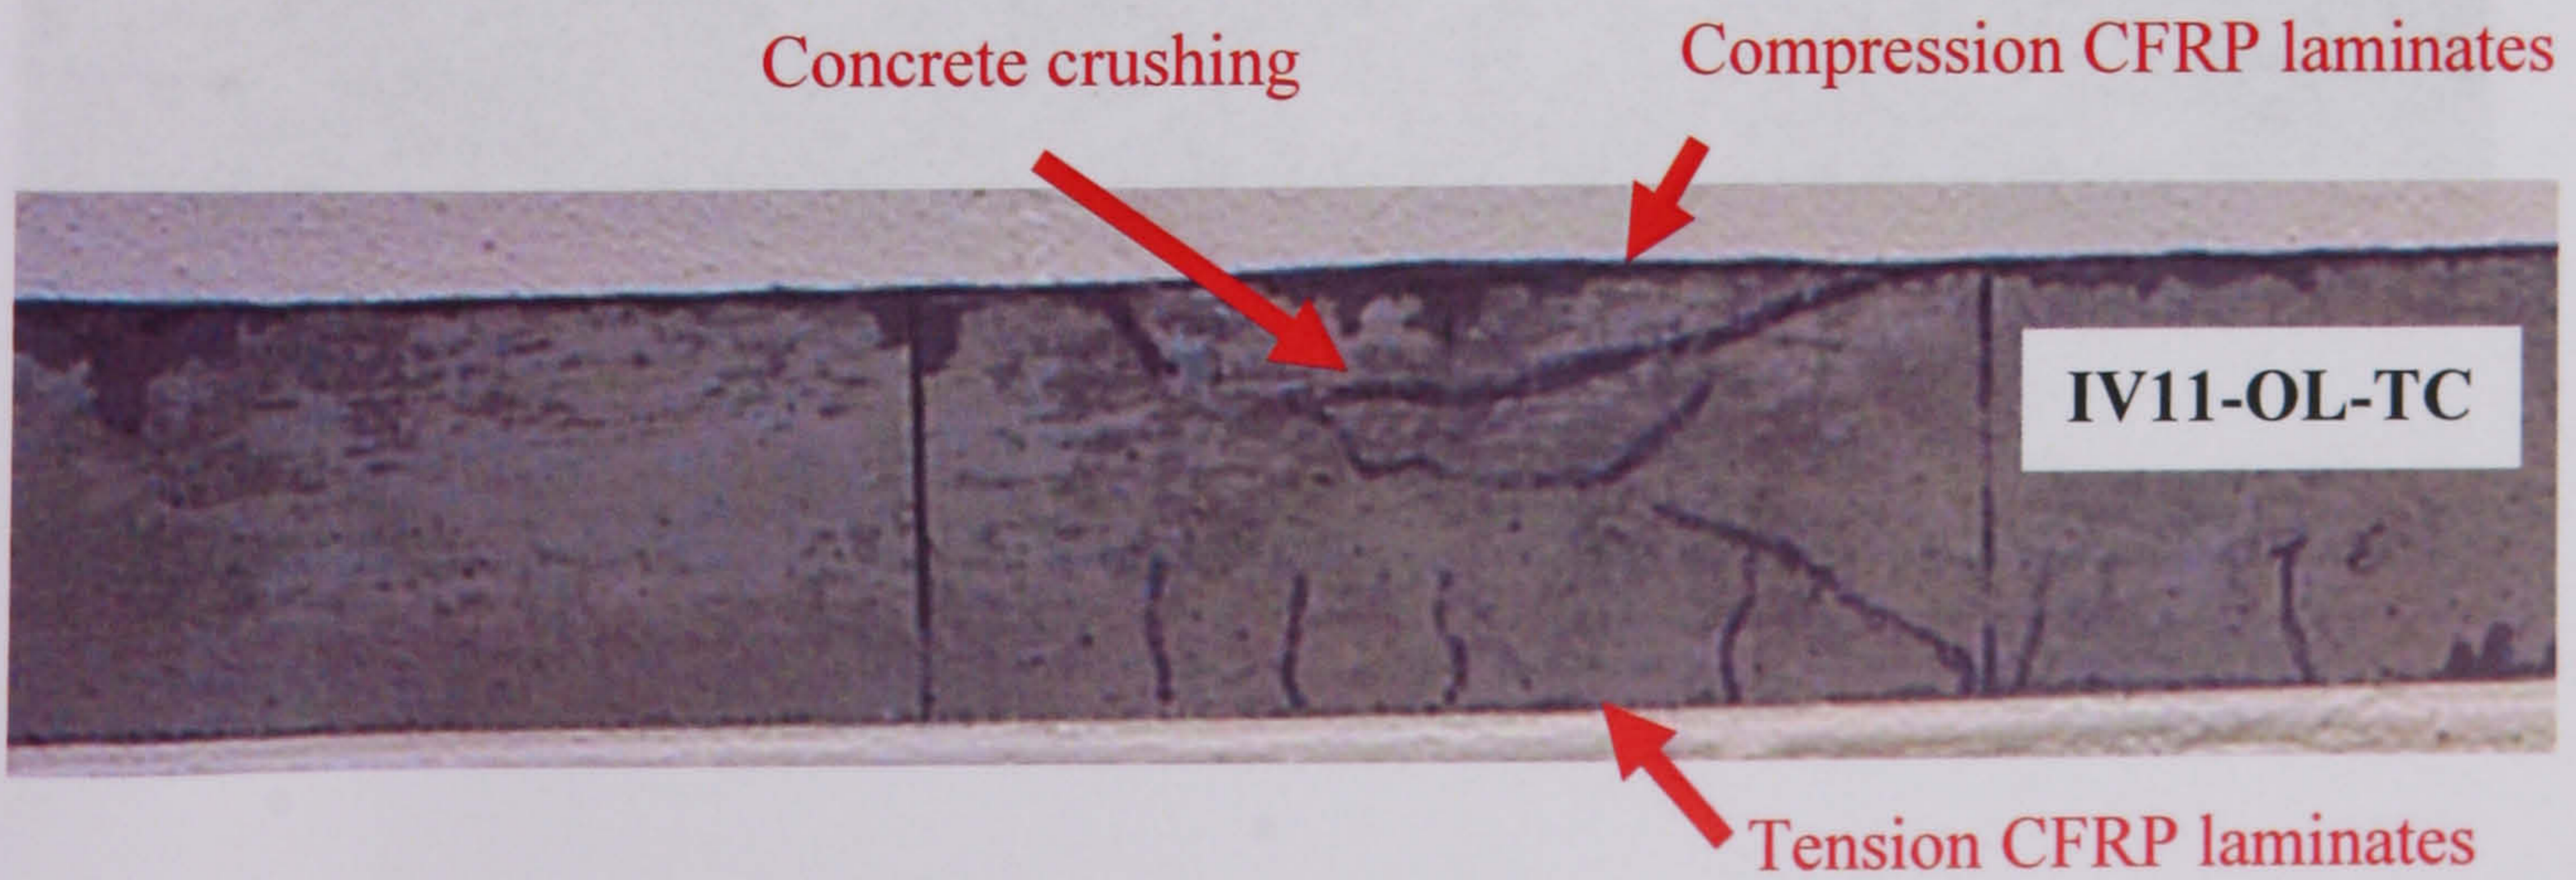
Flexural failure due to concrete crushing at mid-span of beam IV11-OL-TC
